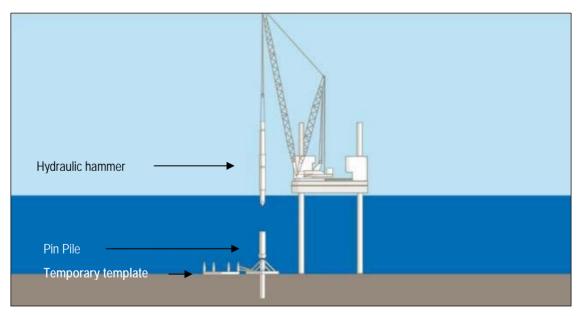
Pre-Installation of the Jacket Piles through a Re-usable Template
